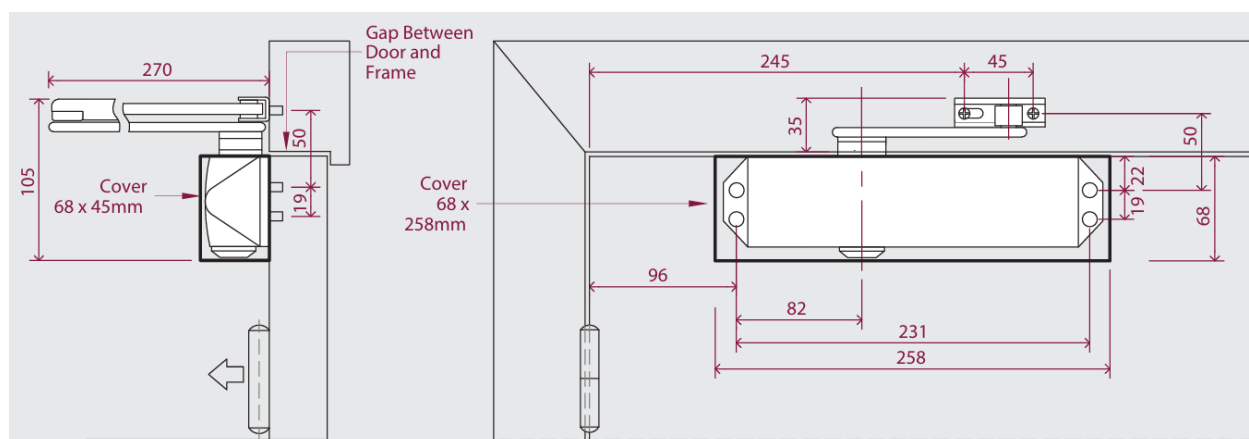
Item 30 – Rutland TS5204 Door Closer Drawing
